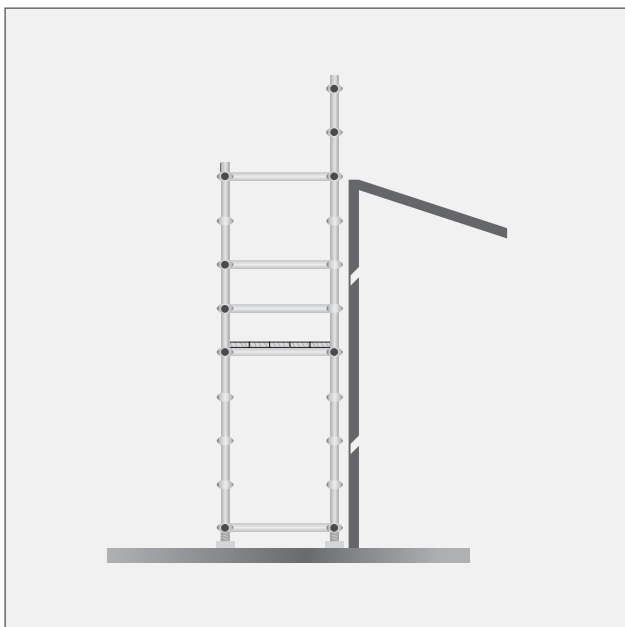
(g) Inside standards supporting guardrailing adjacent to a roof structure that slopes away from the top edge.
